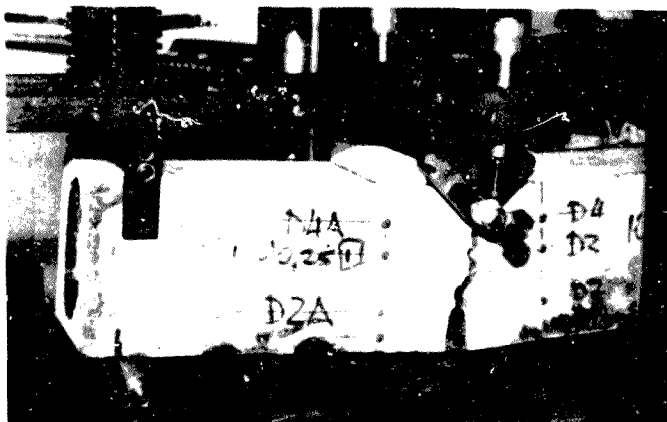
Detailed view of small fracture beam in Timmerson machine (Series F3)
